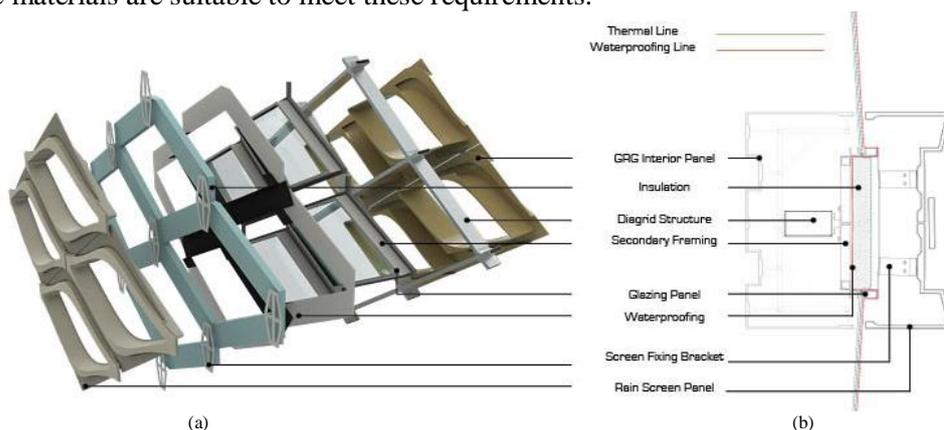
1st design approach: on-site stick elements & rain screen (a) exploded view (b) cross-section detail.
